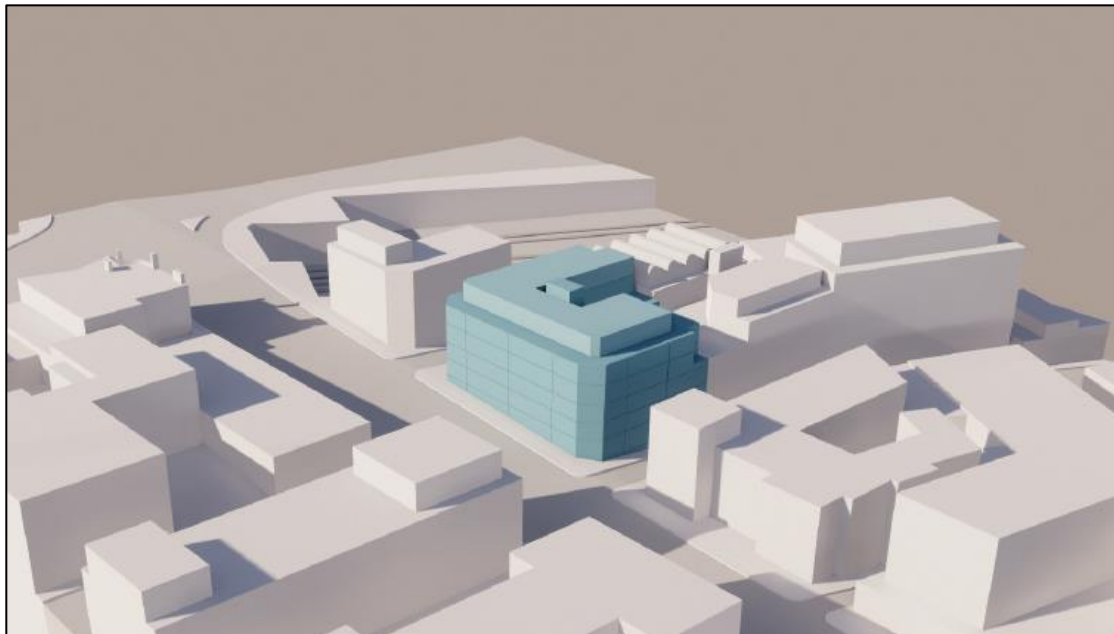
Proposed Massing Viewed Along Cleveland Street Looking South East
